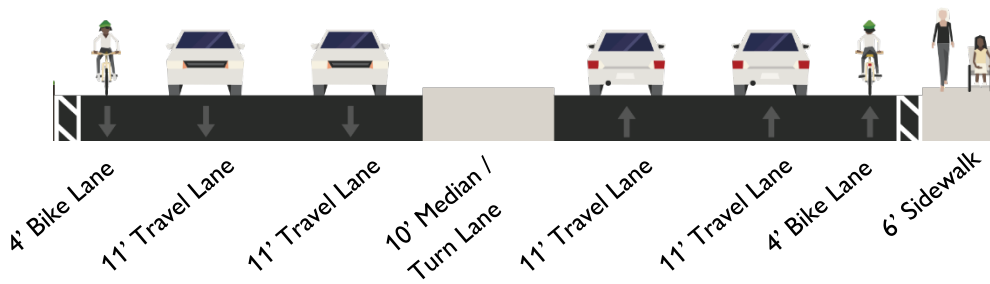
Highway 2 Typical Cross-section - Quebec to E. 96th
